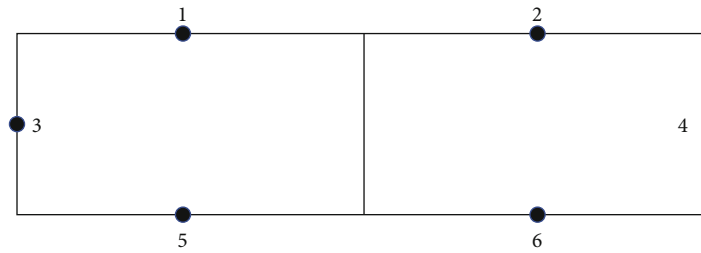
Earth pressure measuring point layout of upper tunnel.
